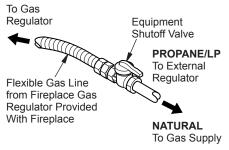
Attaching Flexible Gas Line to Equipment Shutoff Valve
